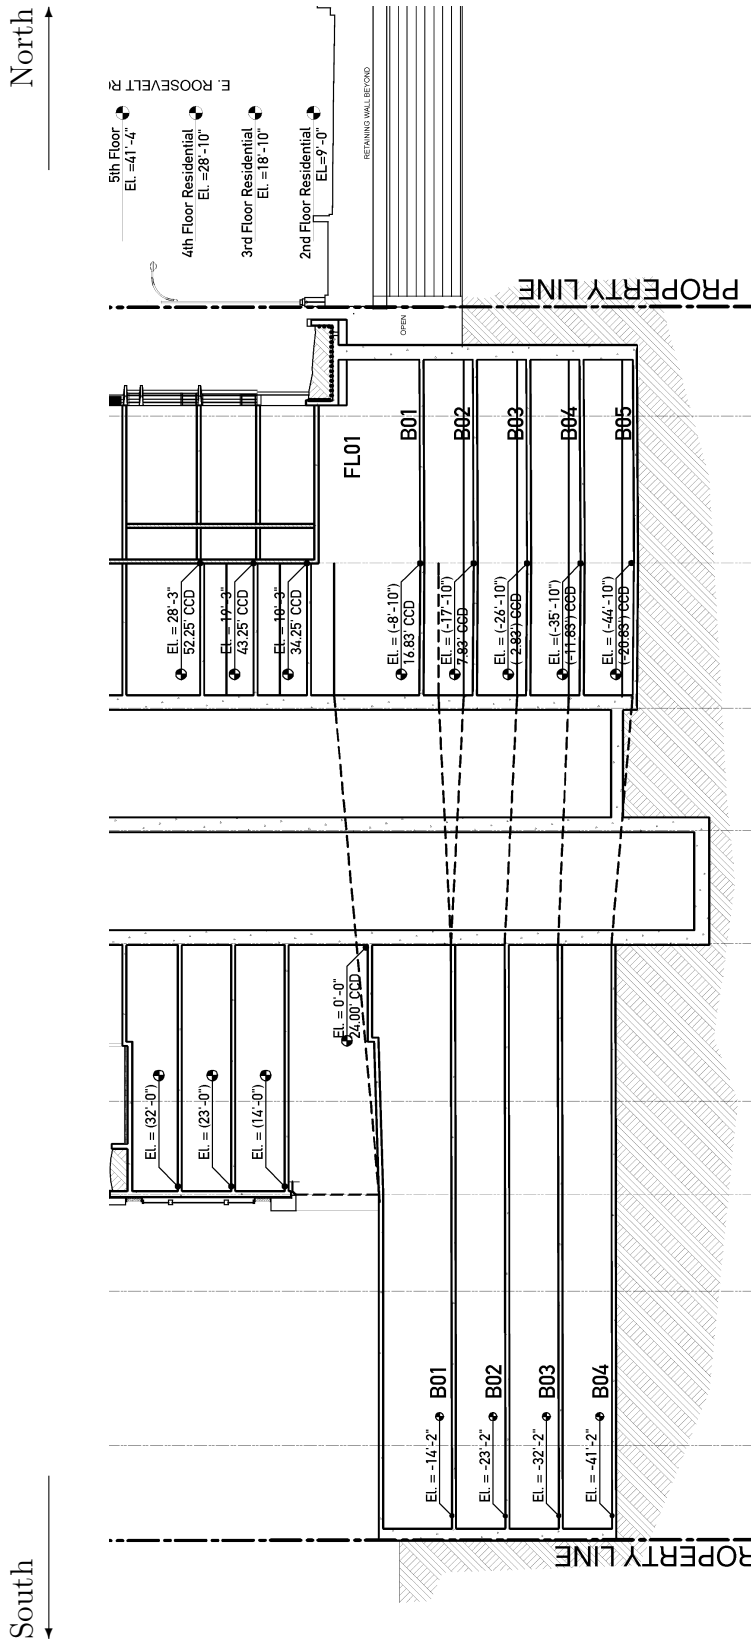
North-South section along basements (looking West). (Dimensions in feet)
